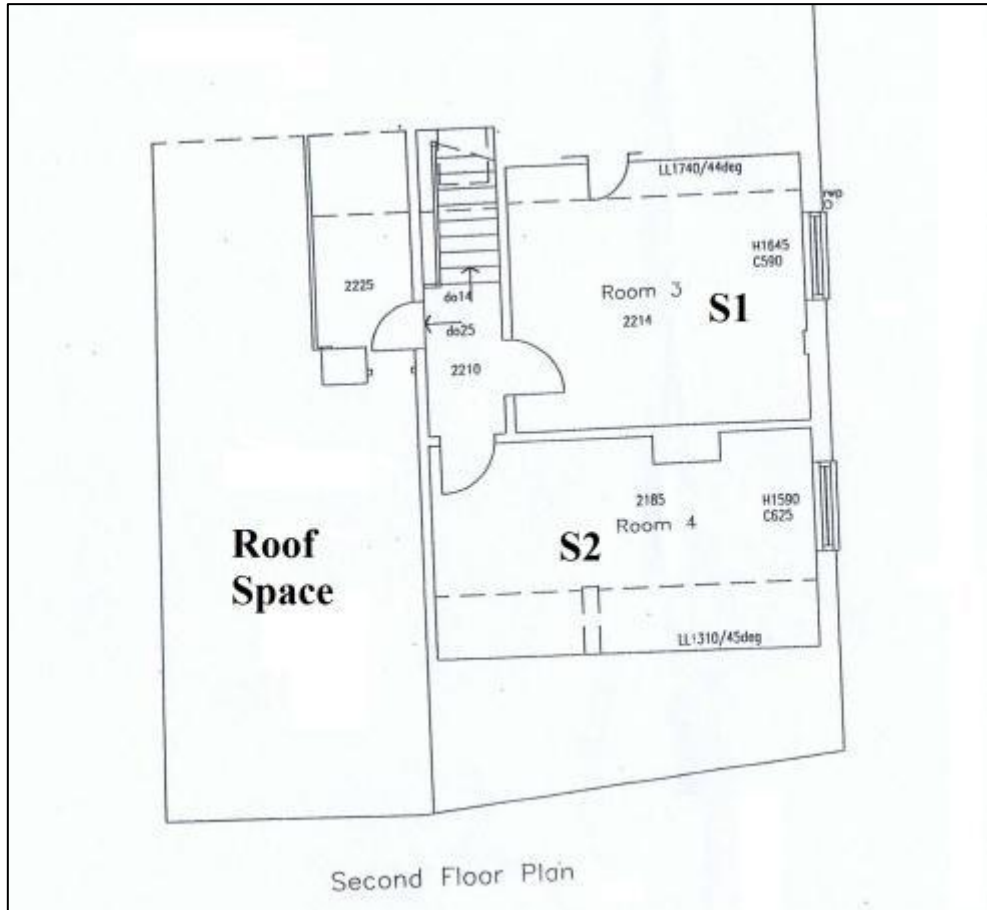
224 High Street, Lewes: Second Floor Plan
